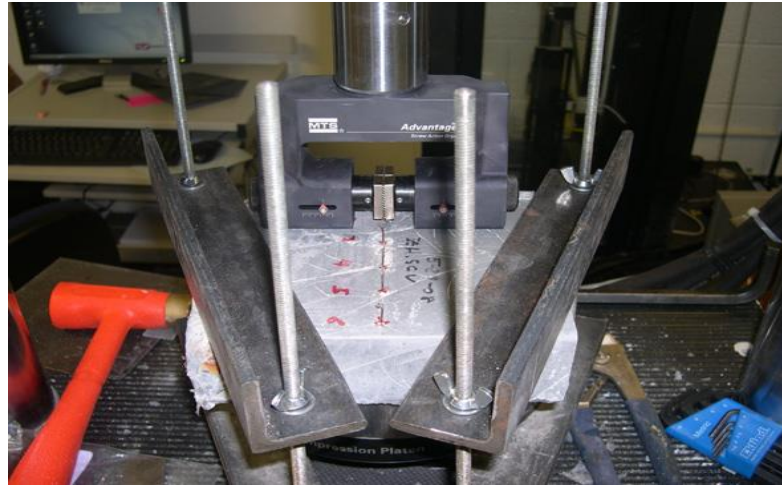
Specimen restraint diagram (pullout test) (Abu-Lebdeh et al., 2011).
